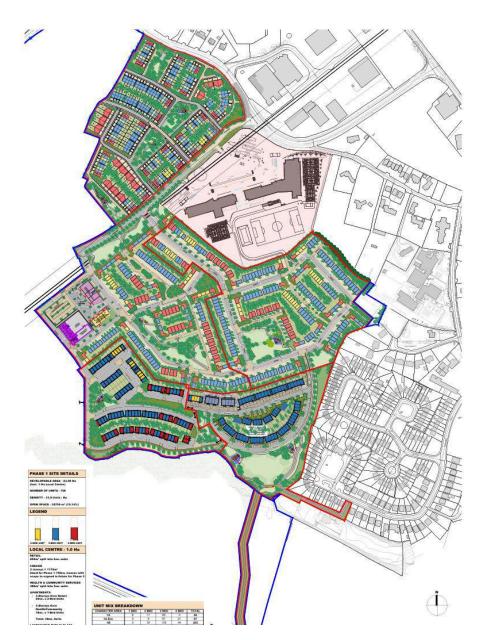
Alternative Layout D - S247 Meeting request to Wicklow County Council for a Large-scale Residential Development, Site Layout Plan
